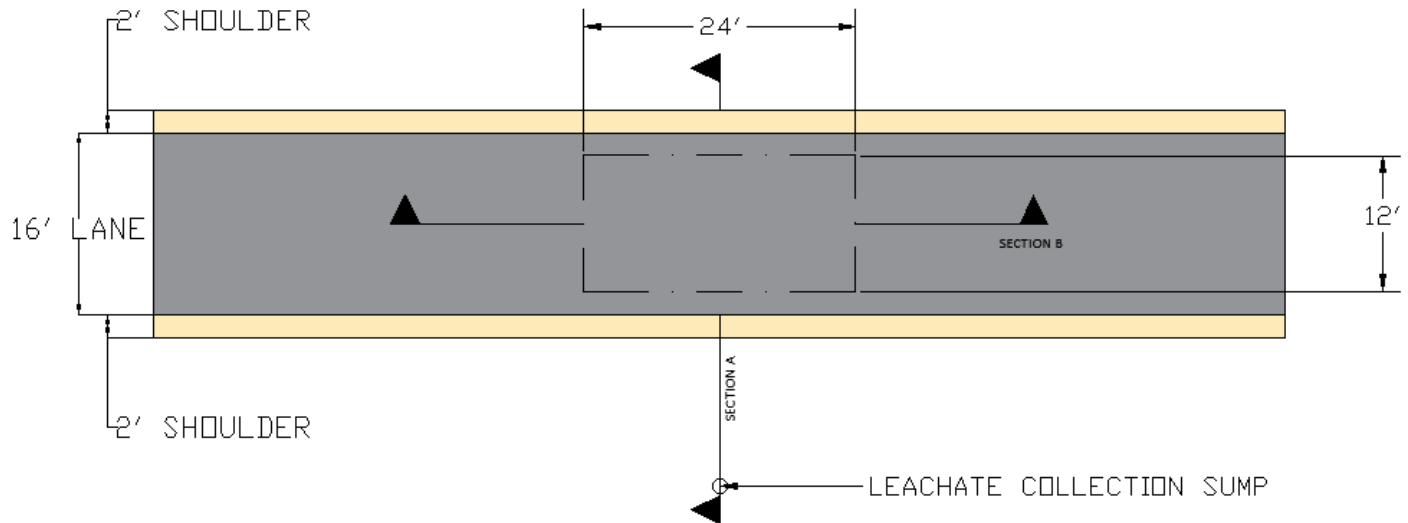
Plan view of lysimeter design. 24-ft by 12-ft collection area is centered on the road, captured infiltration is led to a collection vessel or sump located a minimum of 5-ft from the shoulder.
